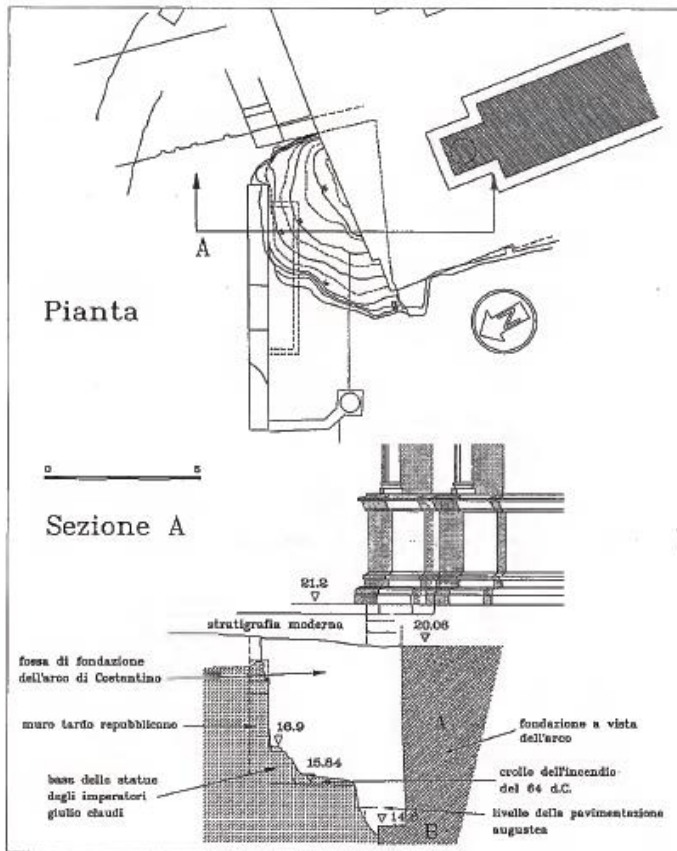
Schematic reconstruction in plan and N-S section, view from the west [2].
